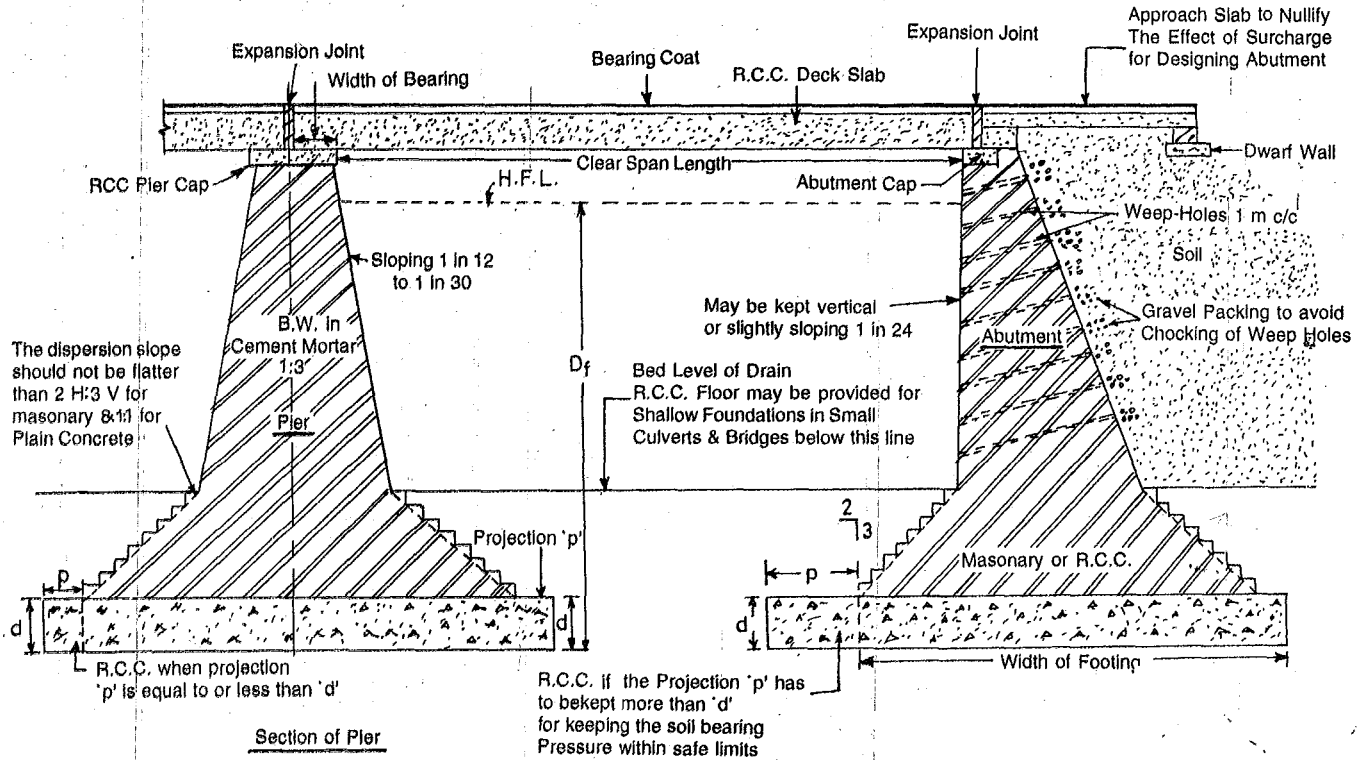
(b) Section of abutment and piers for a slab bridge.
